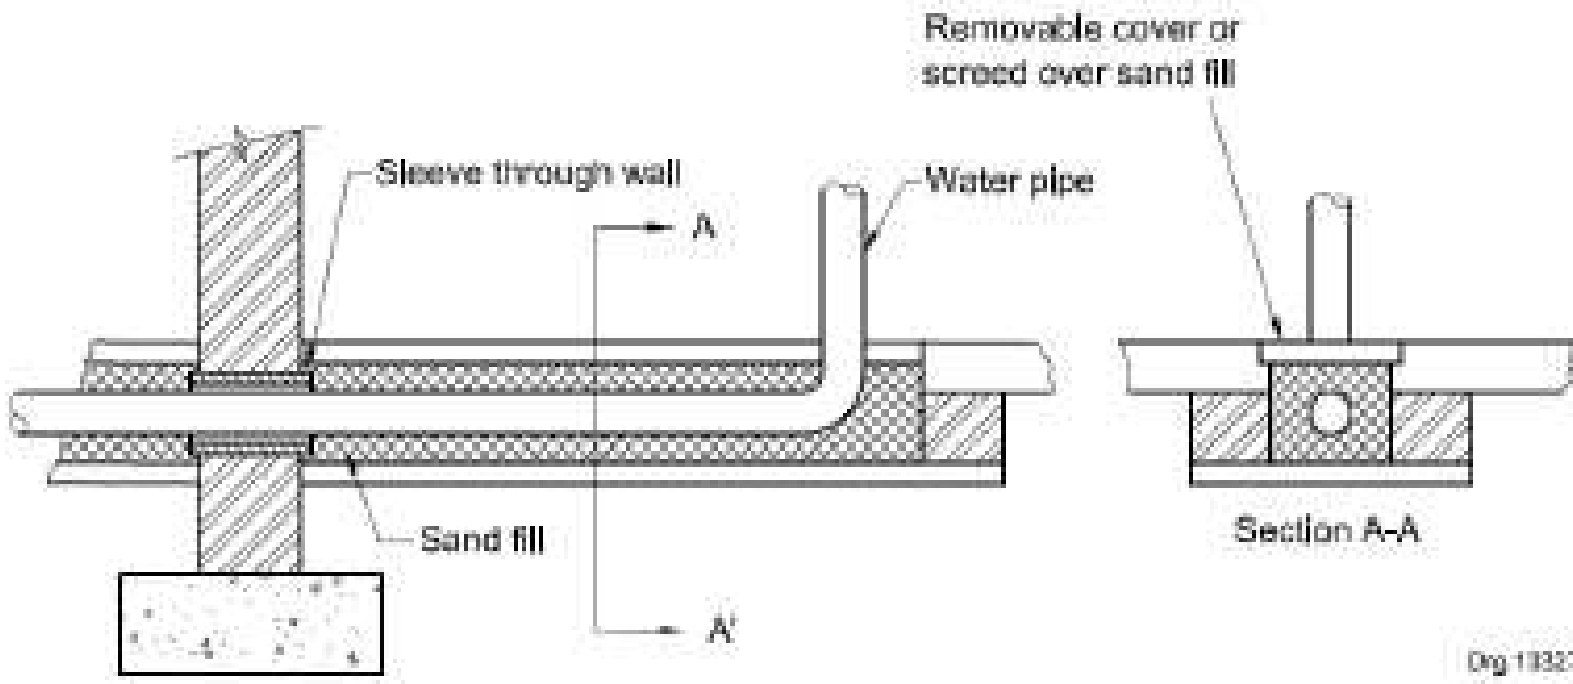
Example of a duct for installing a water pipe within a surface slab or a floor
